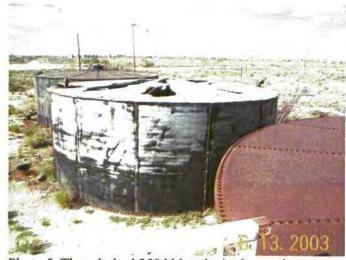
Three bolted 250 bbl tanks in the northeast corner of facility. Looking north-northeast.
